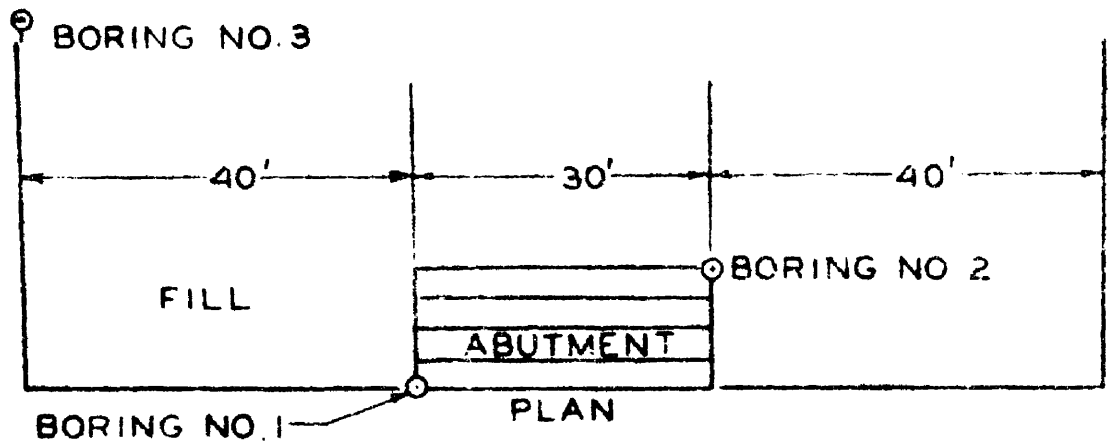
FILL AND ABUTMENT STABILITY PROBLEM
